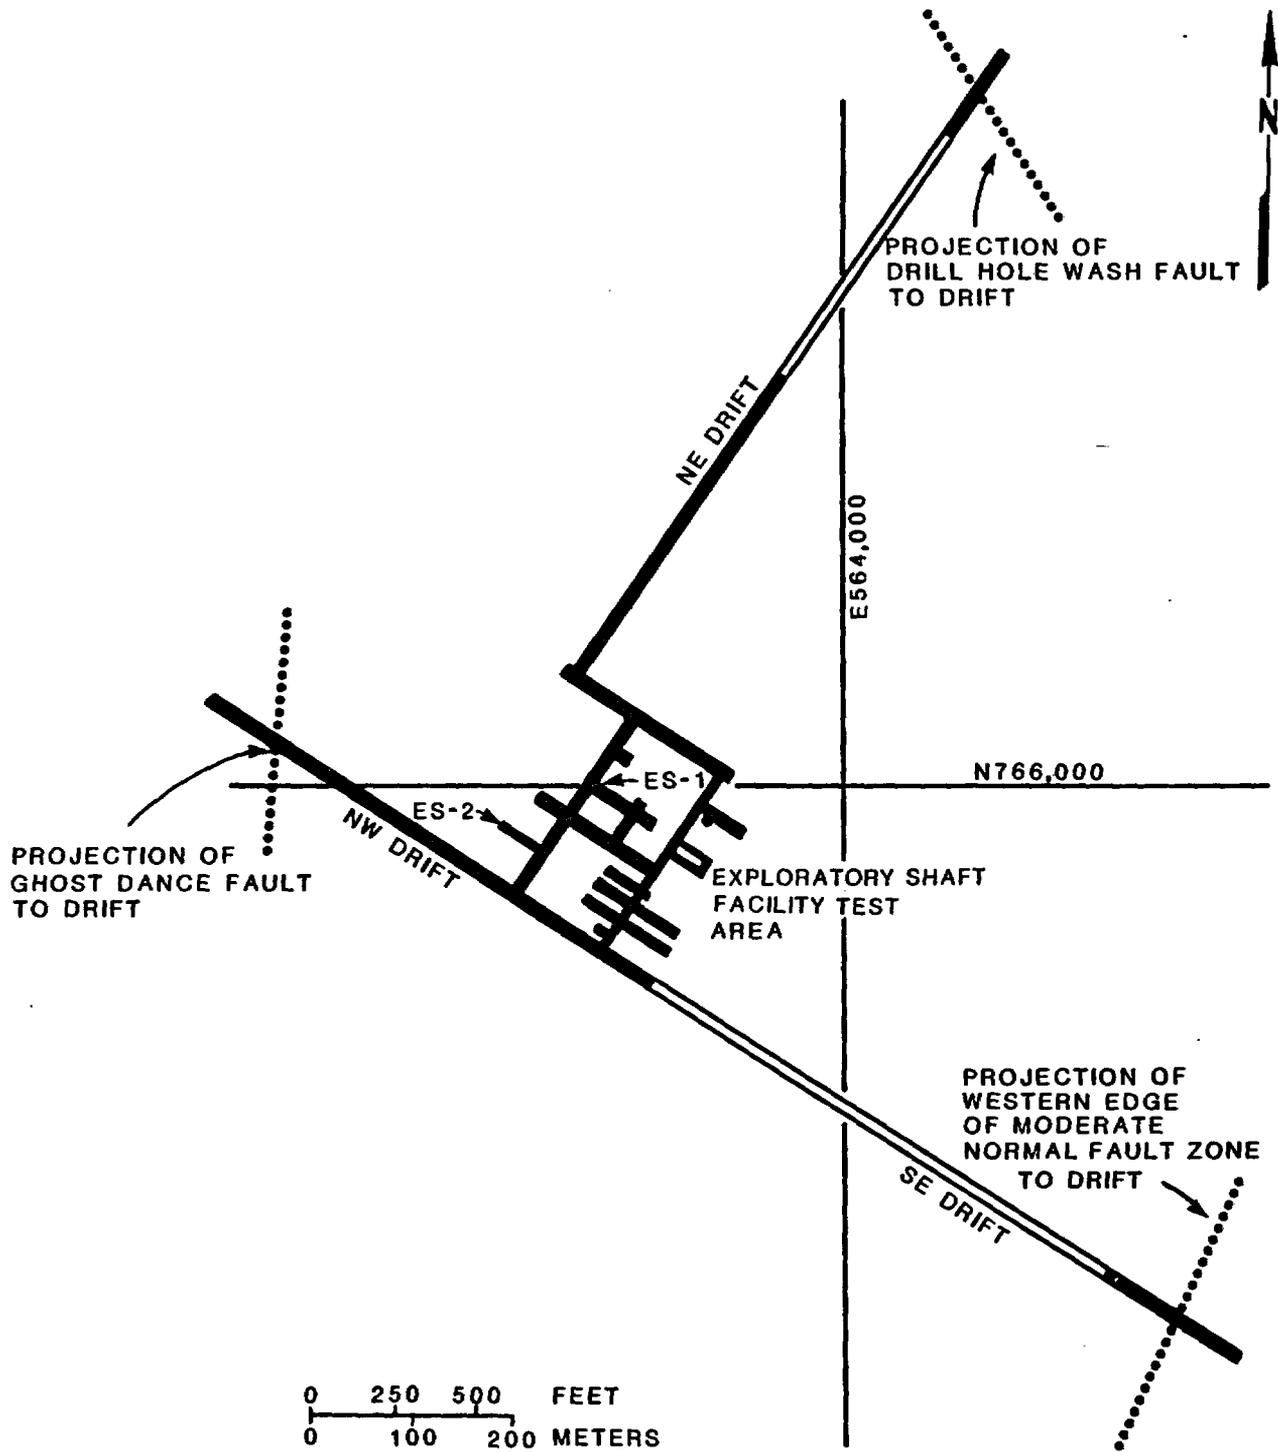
Proposed layout of exploratory shaft and drifts.
